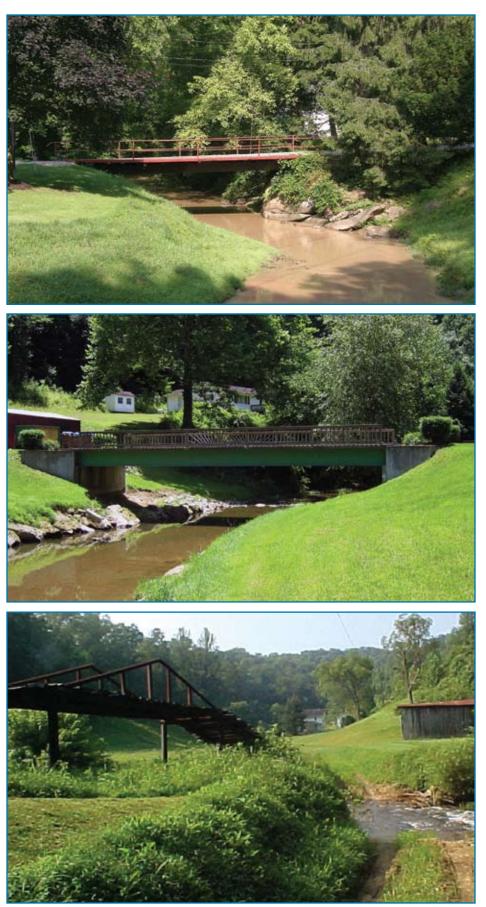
Bridge with wing walls direct water flow during high water to avoid washout of bridge approach and increase of water flow velocity. Guardrails on bridge safeguard traffic passage.
